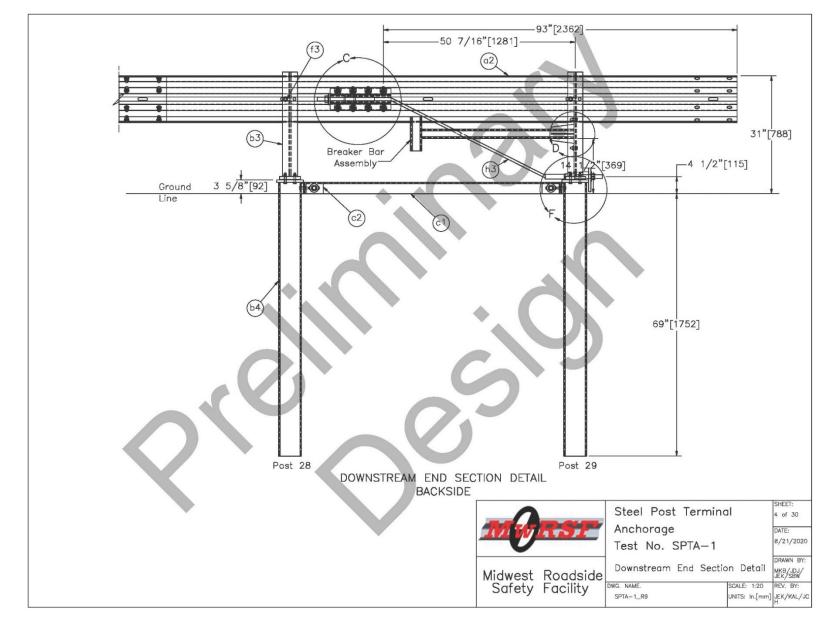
Downstream End Section Detail, Test No. SPTA-1
